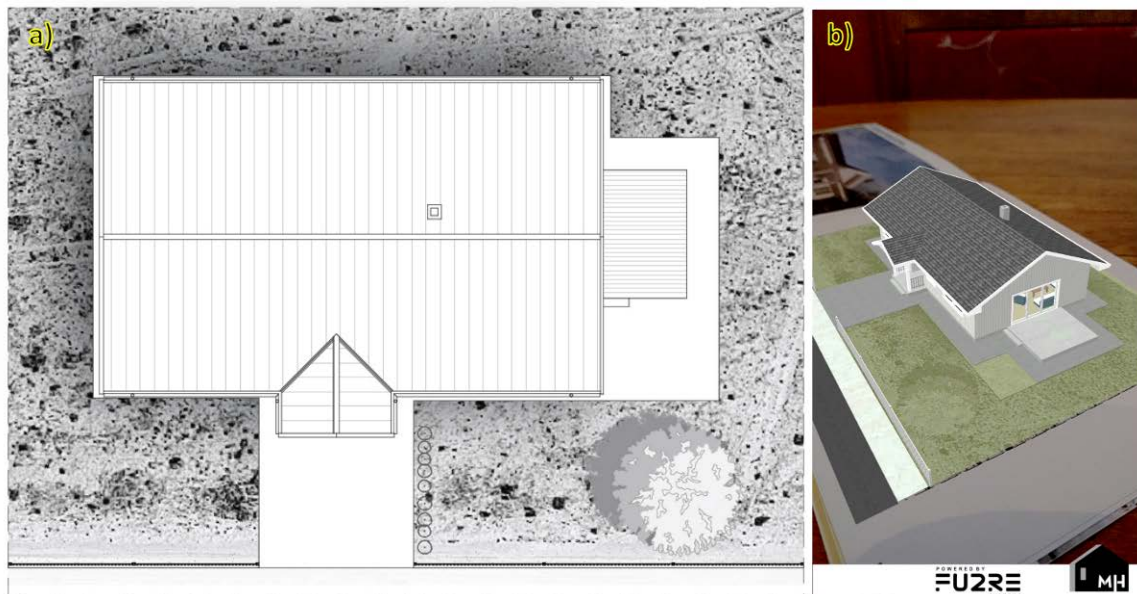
MH Petra: a) Site plan (marker); b) Augmented Reality presentation of entire house 3D model
